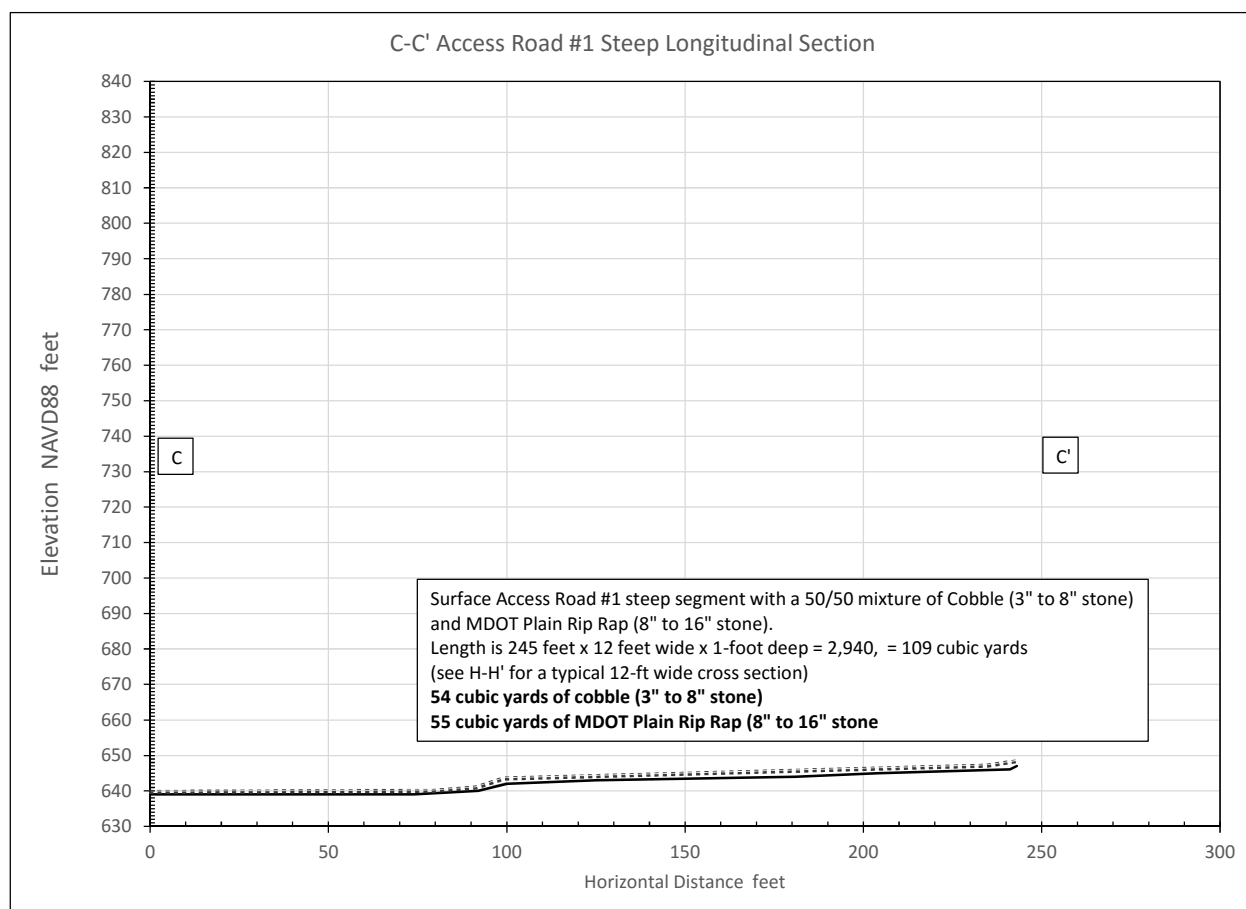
Access Road #1 longitudinal section (COMPLETED UNDER THE EMERGENCY WEST END WORK).
